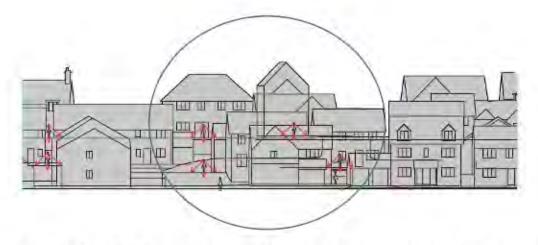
South Site Section FF continued, showing the relationship of upper terraces and the properties below, and the potential overlooking.
